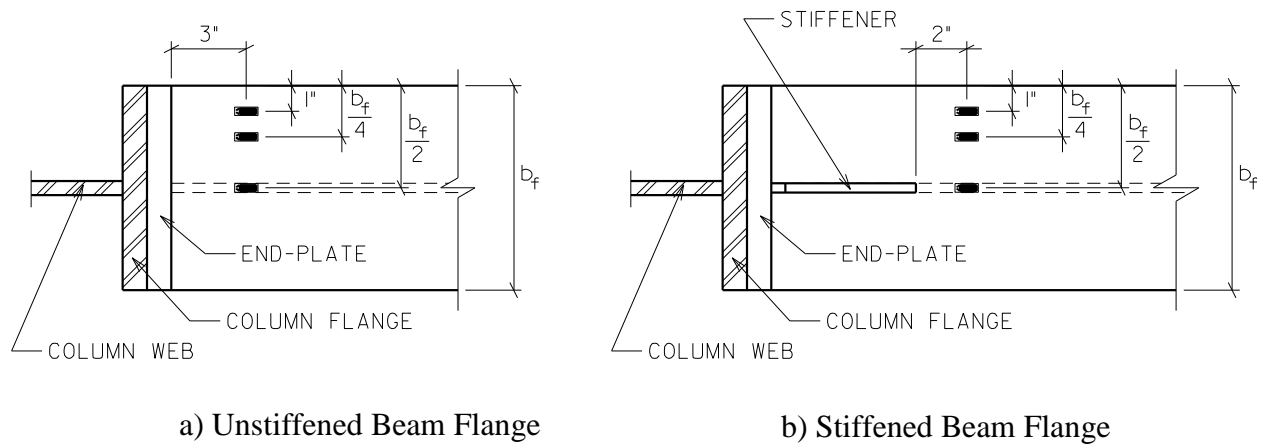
STRAIN GAGE CONFIGURATIONS ON BEAM FLANGES
